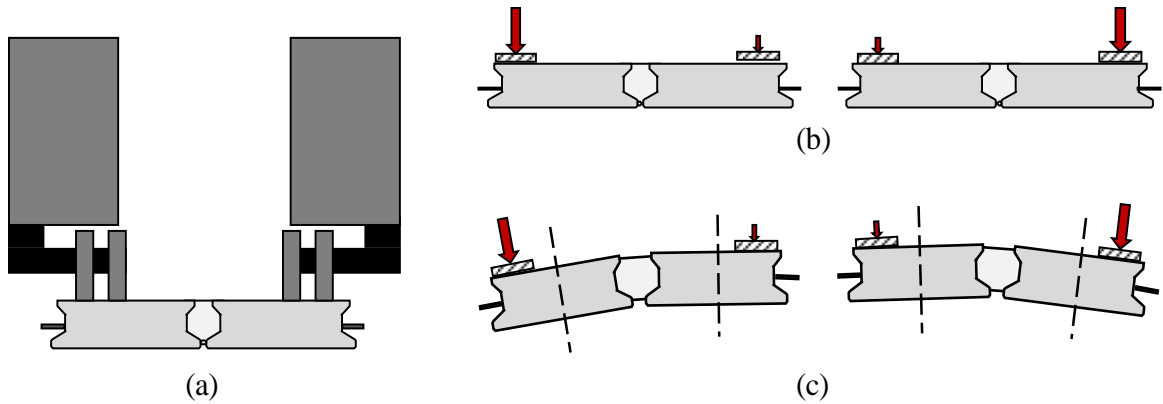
Alternating Load Configuration 2-3 with (a) half-truck rear axles outside the joint centerline, (b) specimen load point locations, and (c) deformed specimen due to applied load
